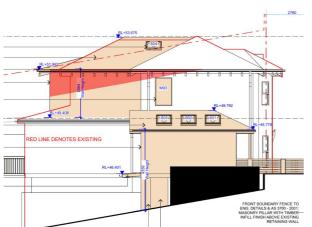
South Elevation amended to demonstrate the extent of the wall height breach (shaded red). Source: Action Plans.
